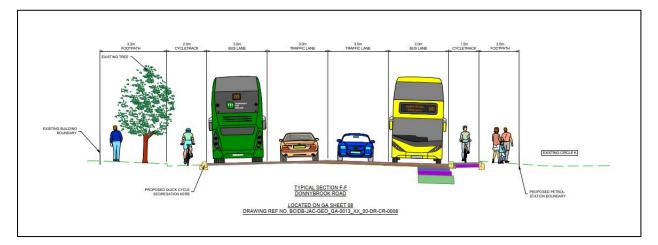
Extract from Typical Cross-section Drawing at Morehampton and Donnybrook (Sheet 03)
